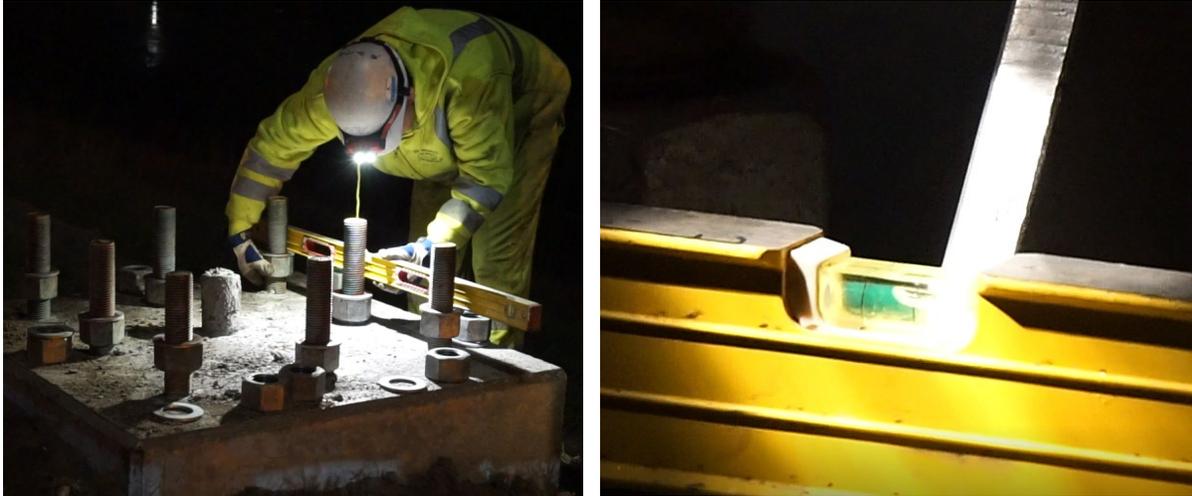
Leveling nuts on sign truss structure (left) and final installation of COSS out of plumb (right)
